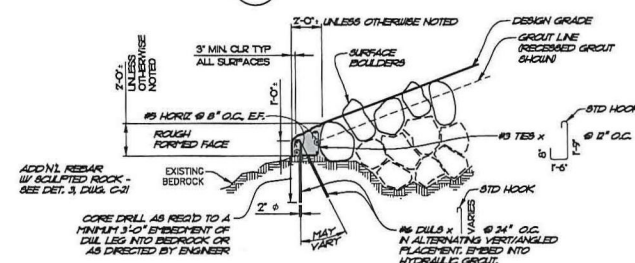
DETAIL NOTE: DILL PLACEMENT MAY BEND TO ALIGN WITH VOIDS @ 30" MAX EL. DIRECTION PRIOR TO GROUTING. TOP BENT LEG SHALL BE 6" CLR BELOW DESIGN SURFACE.
